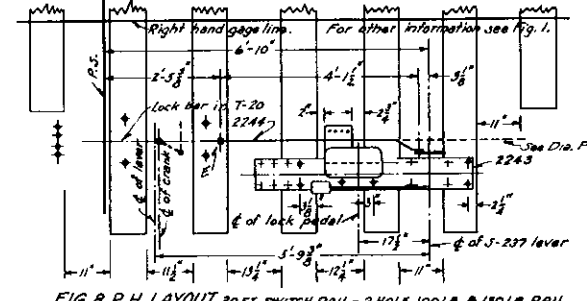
R.H. LAYOUT 30 FT. SWITCH RAIL - 2 HOLE 100 LB. & 130 LB. RAIL.
